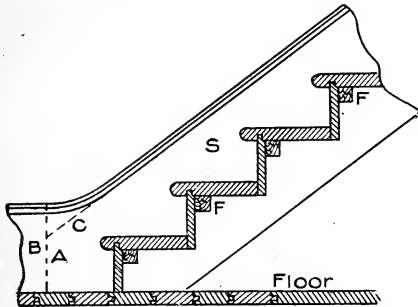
Showing How Wall String is Finished at Foot of Stair.
